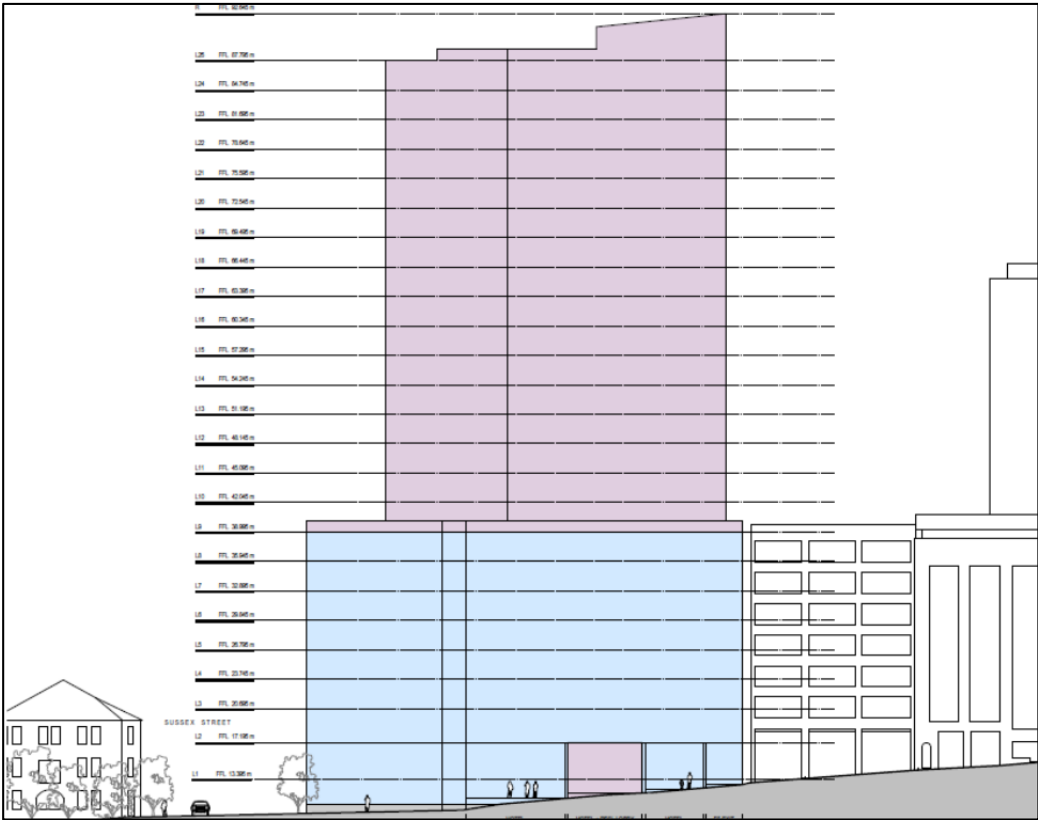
The southern elevation of the proposed building envelope, as viewed from Bathurst Street
